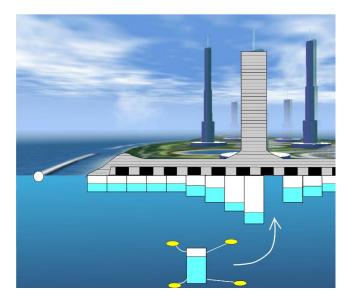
Replace all caissons under and around the skyscrapers with new caissons.
